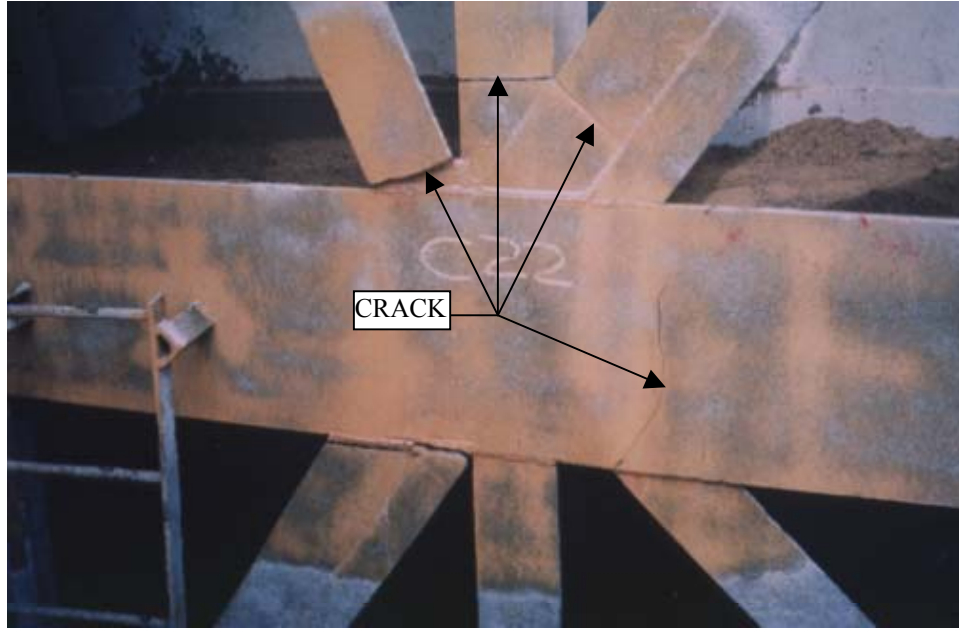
Cracked girder, diaphragm, and bracing in a lift gate
